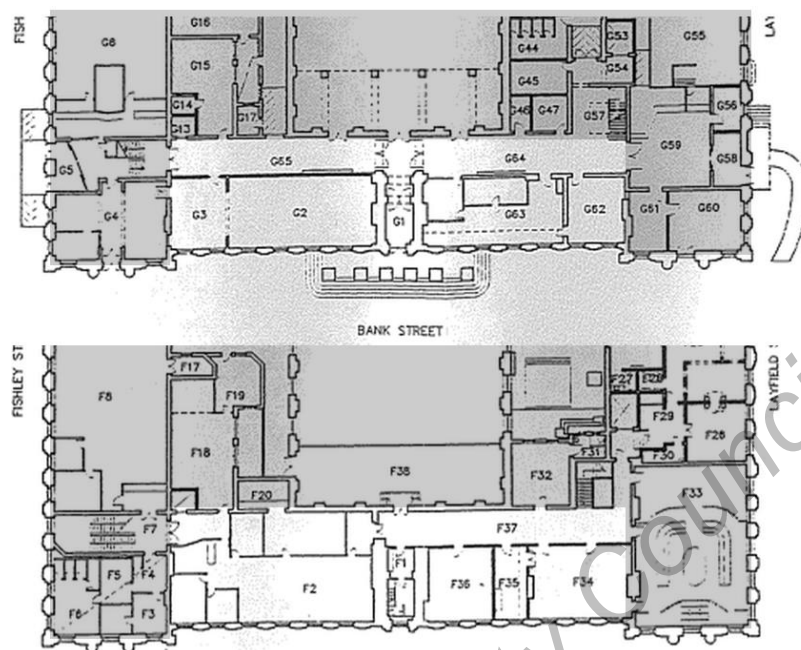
South wing plan arrangement (Ground floor – top; First floor – bottom).
